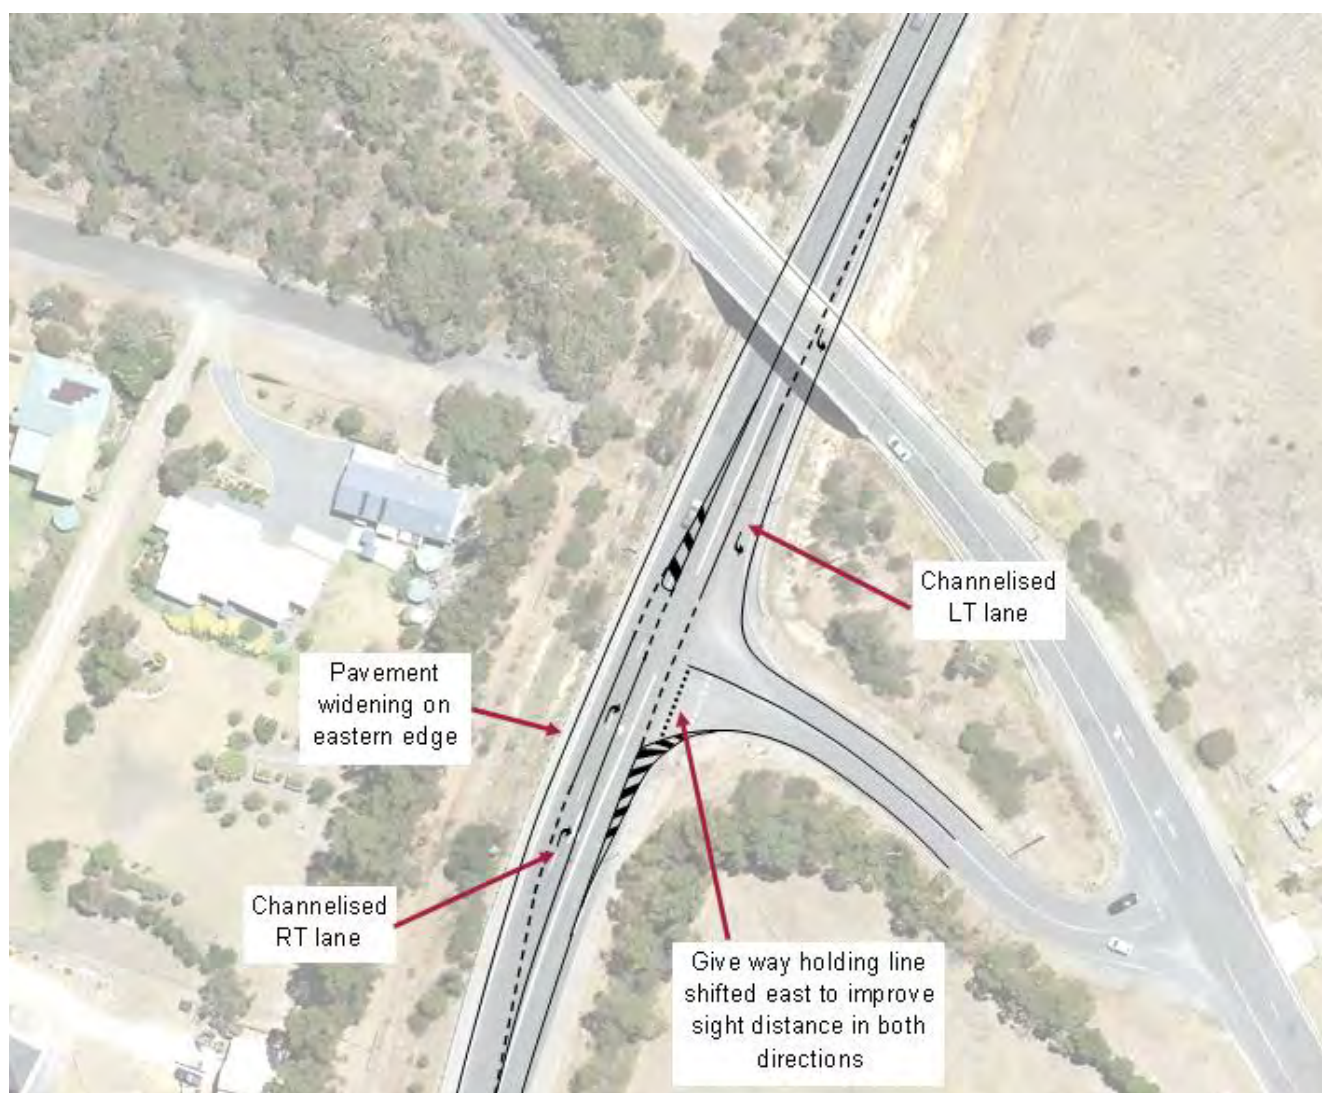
RAA concept sketch of an upgraded Armstrong Road/Greenhills Road intersection
